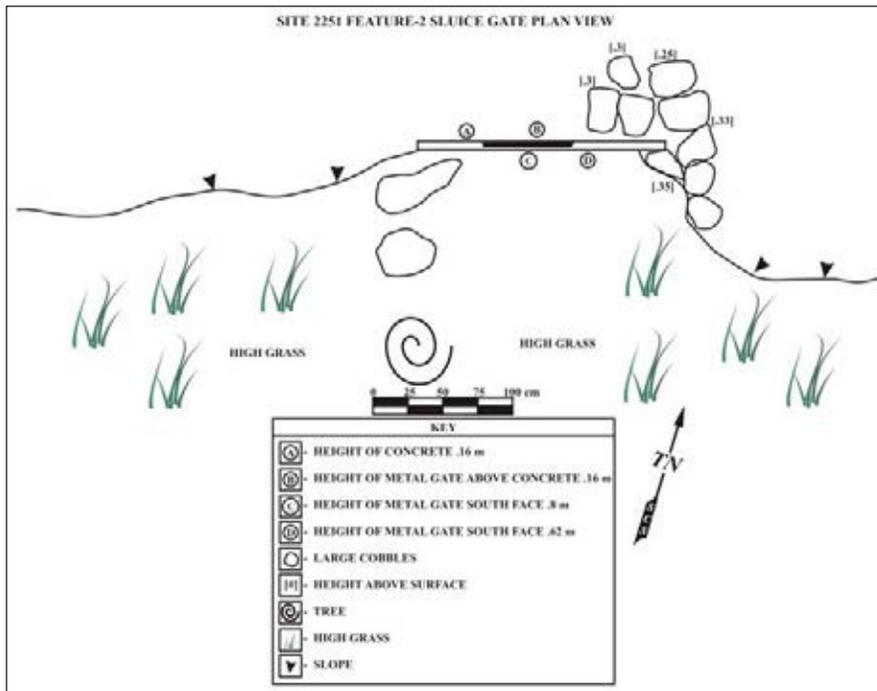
Planview of Site -2251, Feature 2 Sluice Gate.
